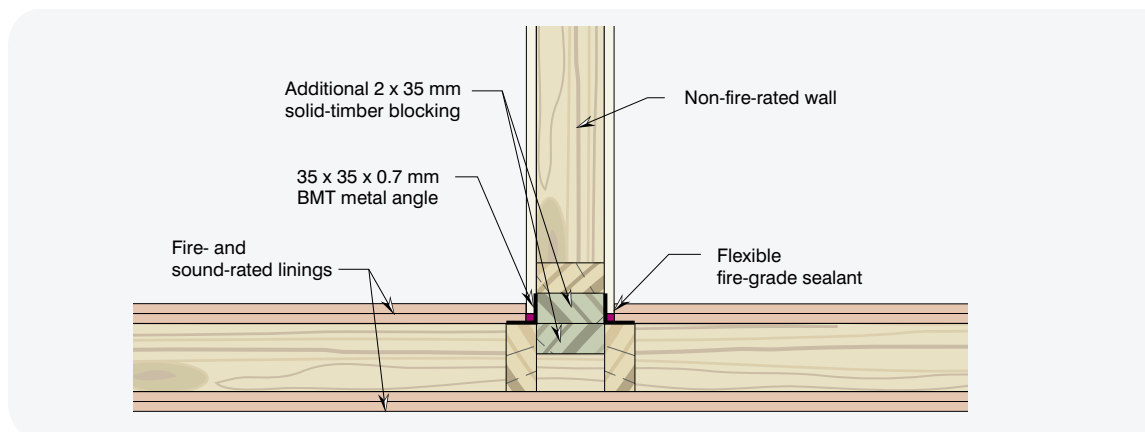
Non-rated wall abutting fire-rated wall using timber blocks and 35 mm metal angle – FRL 90 minutes – plan view.
